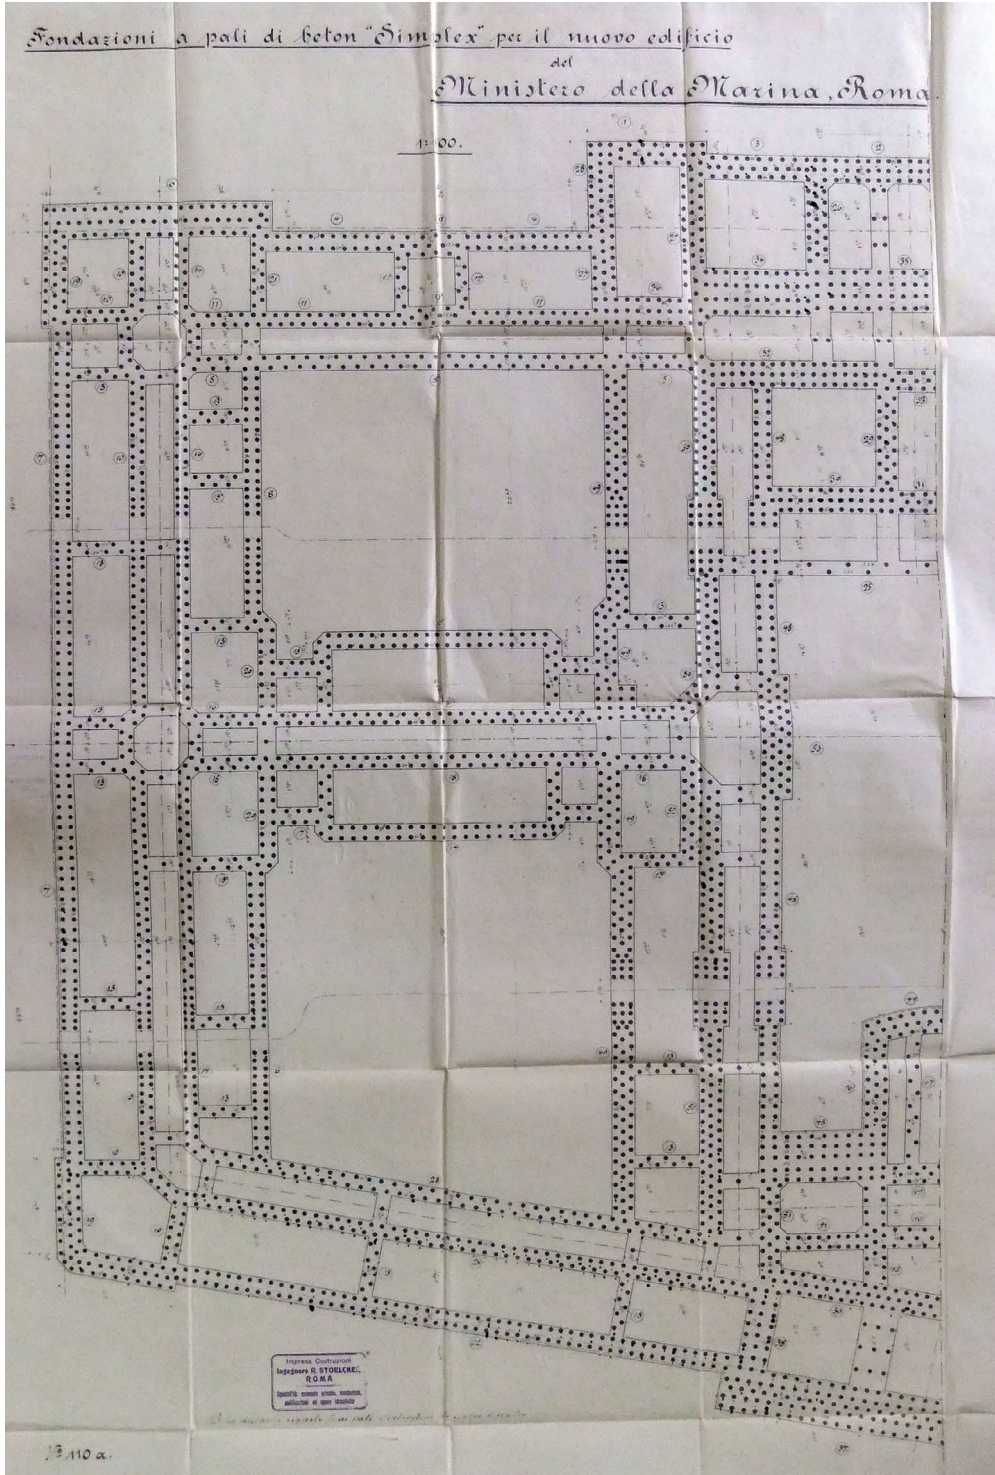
Rome, Ministry of the Navy, planimetry of the foundations with Simplex concrete piles on a scale of 1:100 representing half of the building.
